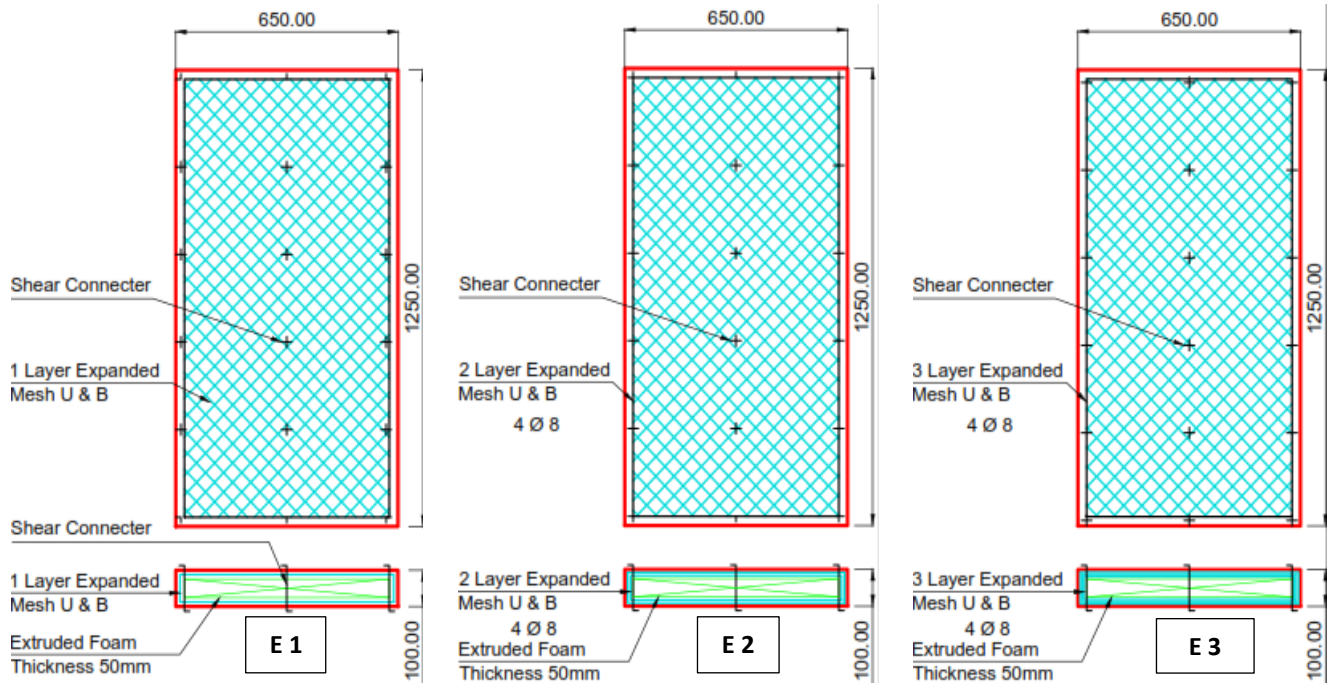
Reinforcement details of Group-3 walls (E1, E2 and E3).
